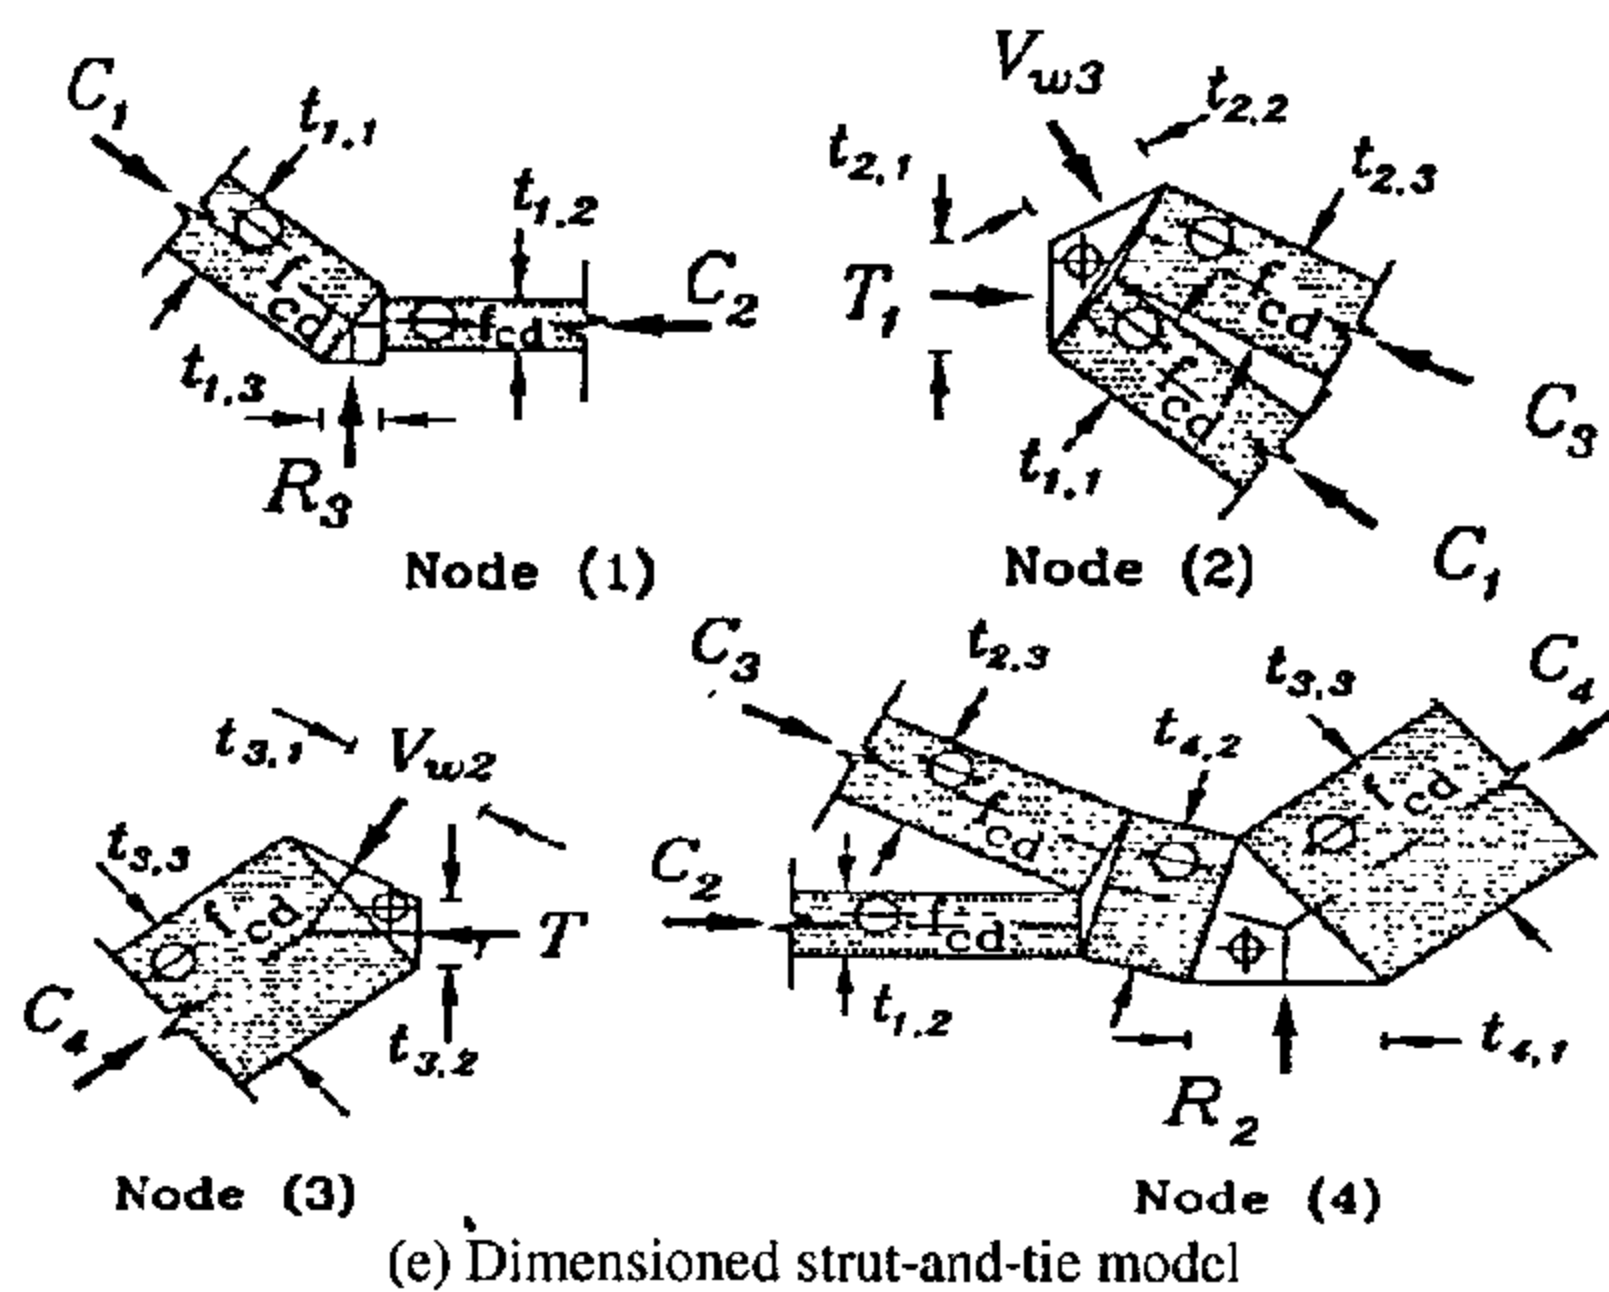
Strut and-tie model for wide box-girder under temporary jacking
